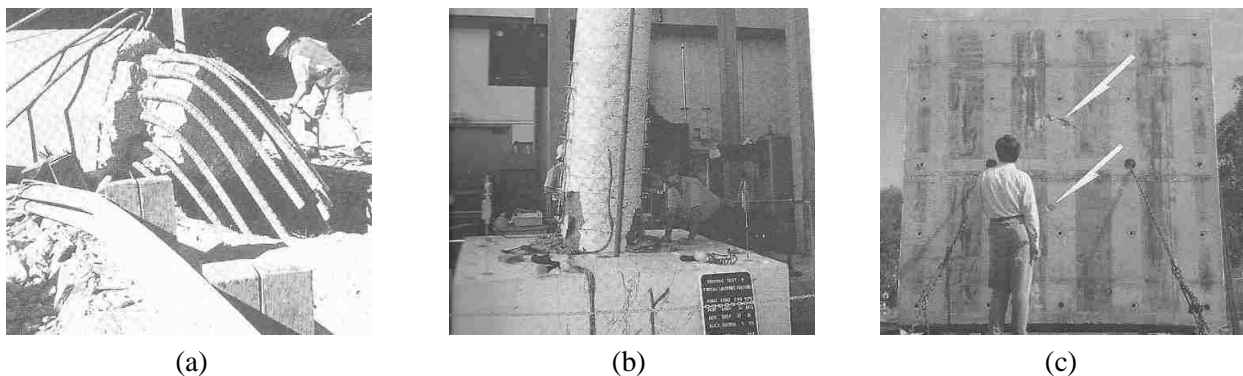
Column-footing joint failures: (a) pullout of longitudinal reinforcement due to insufficient development length, (b) column-footing joint cracking (c) straightening of hooks with penetration through bottom of footing (Priestley et al. 1996).
